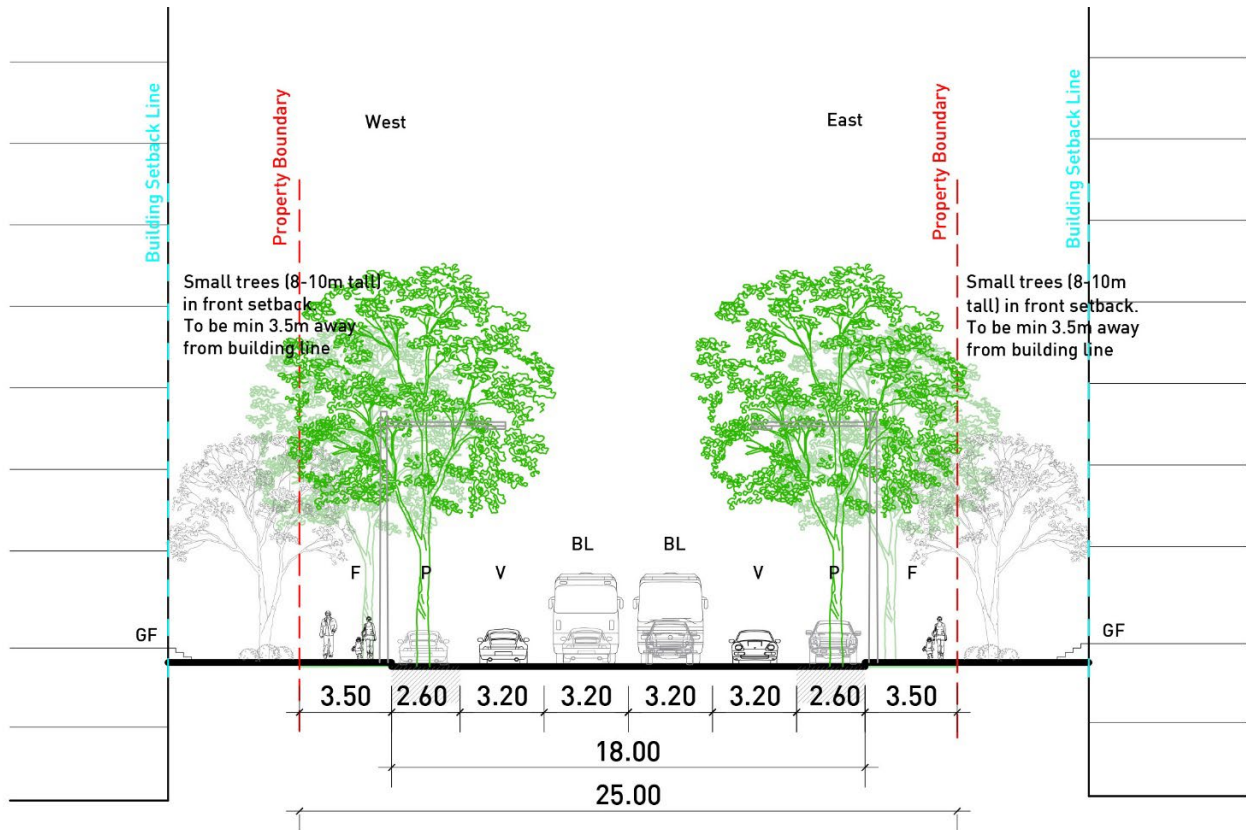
Type 1A Major Road Building to Building (NSR 2)
